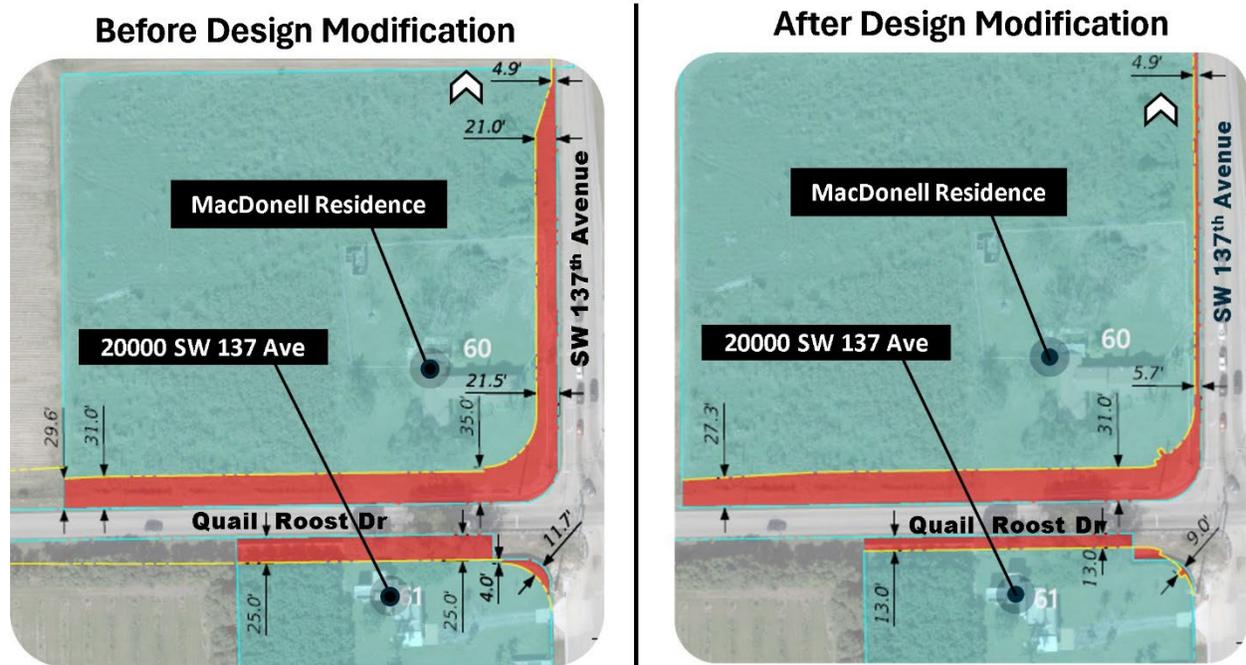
Build Alternative 3 Impact Minimization at SW 137th Avenue Intersection
